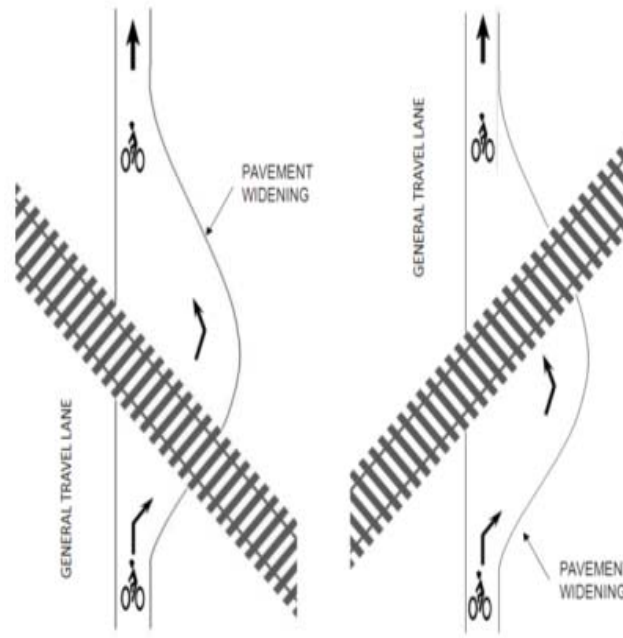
Potential Treatments at a Skewed Railroad Crossing
